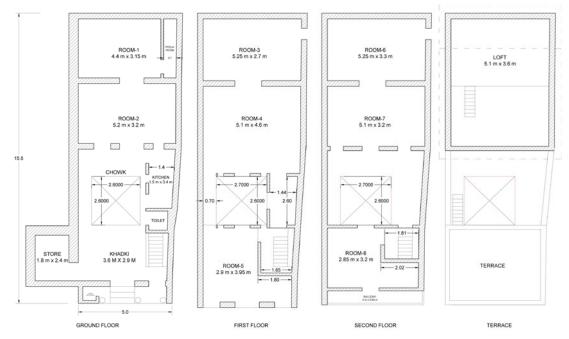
Ground, first, second and third floor plan of Modi house
